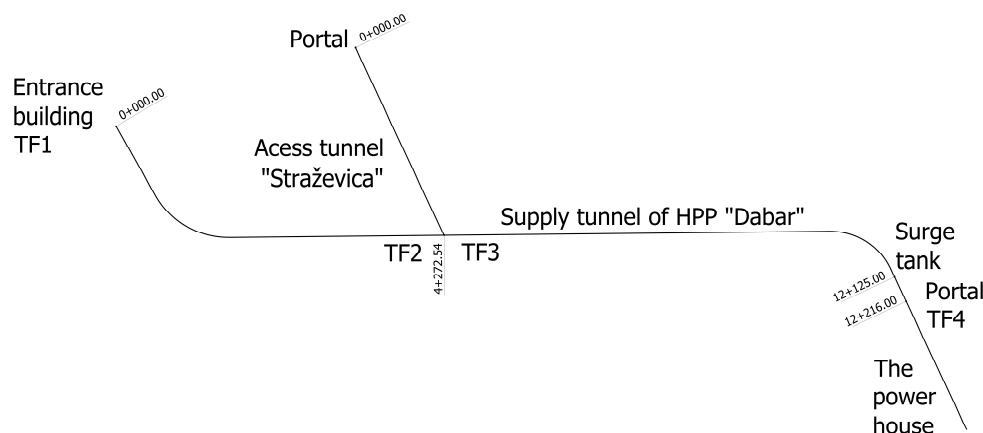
Location plan of the supply tunnel of HPP "Dabar" [30]
